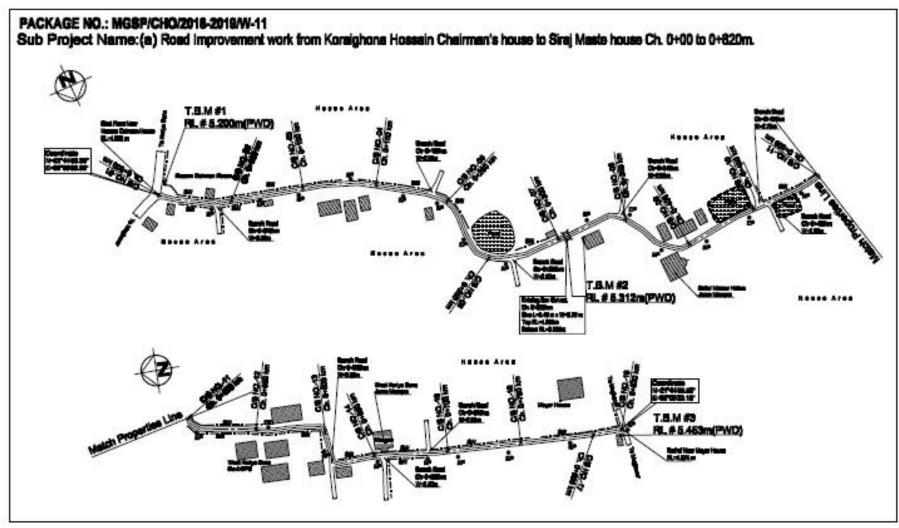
(a): Layout Plan of the proposed Subproject Road from Koraighona Hossain Chairman's house to Siraj Master House
